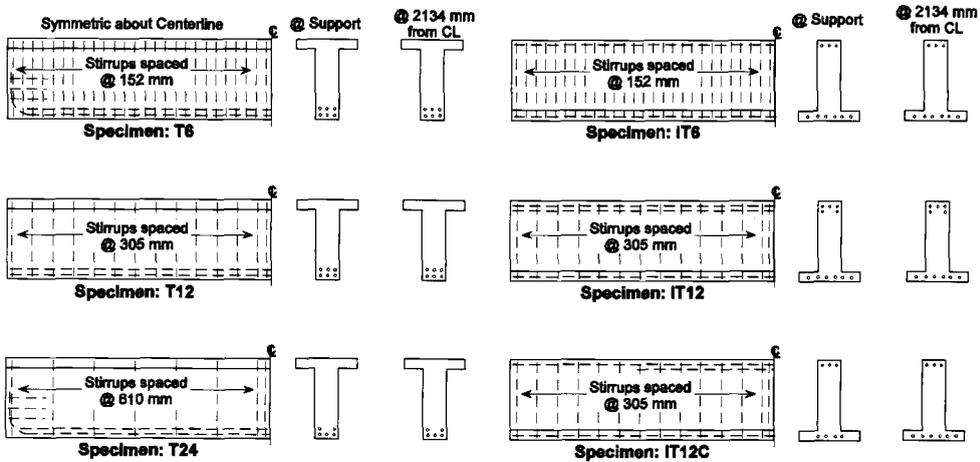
Stirrup and flexural details of LCF specimens.
